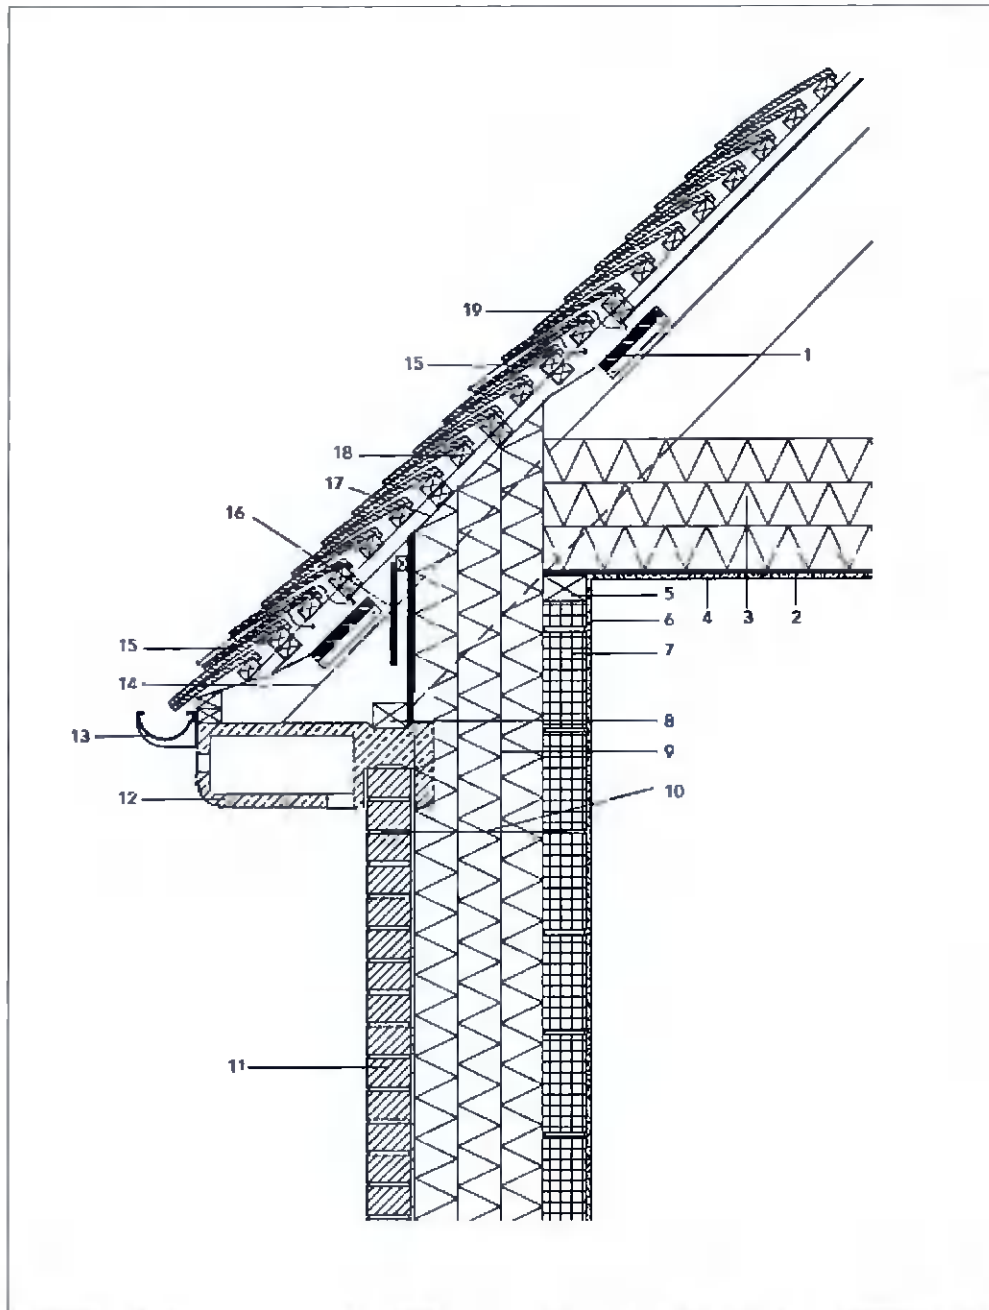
Figure XX. Drawing showing detailed design of roof space for crevice dwelling bats in an insulated space.
